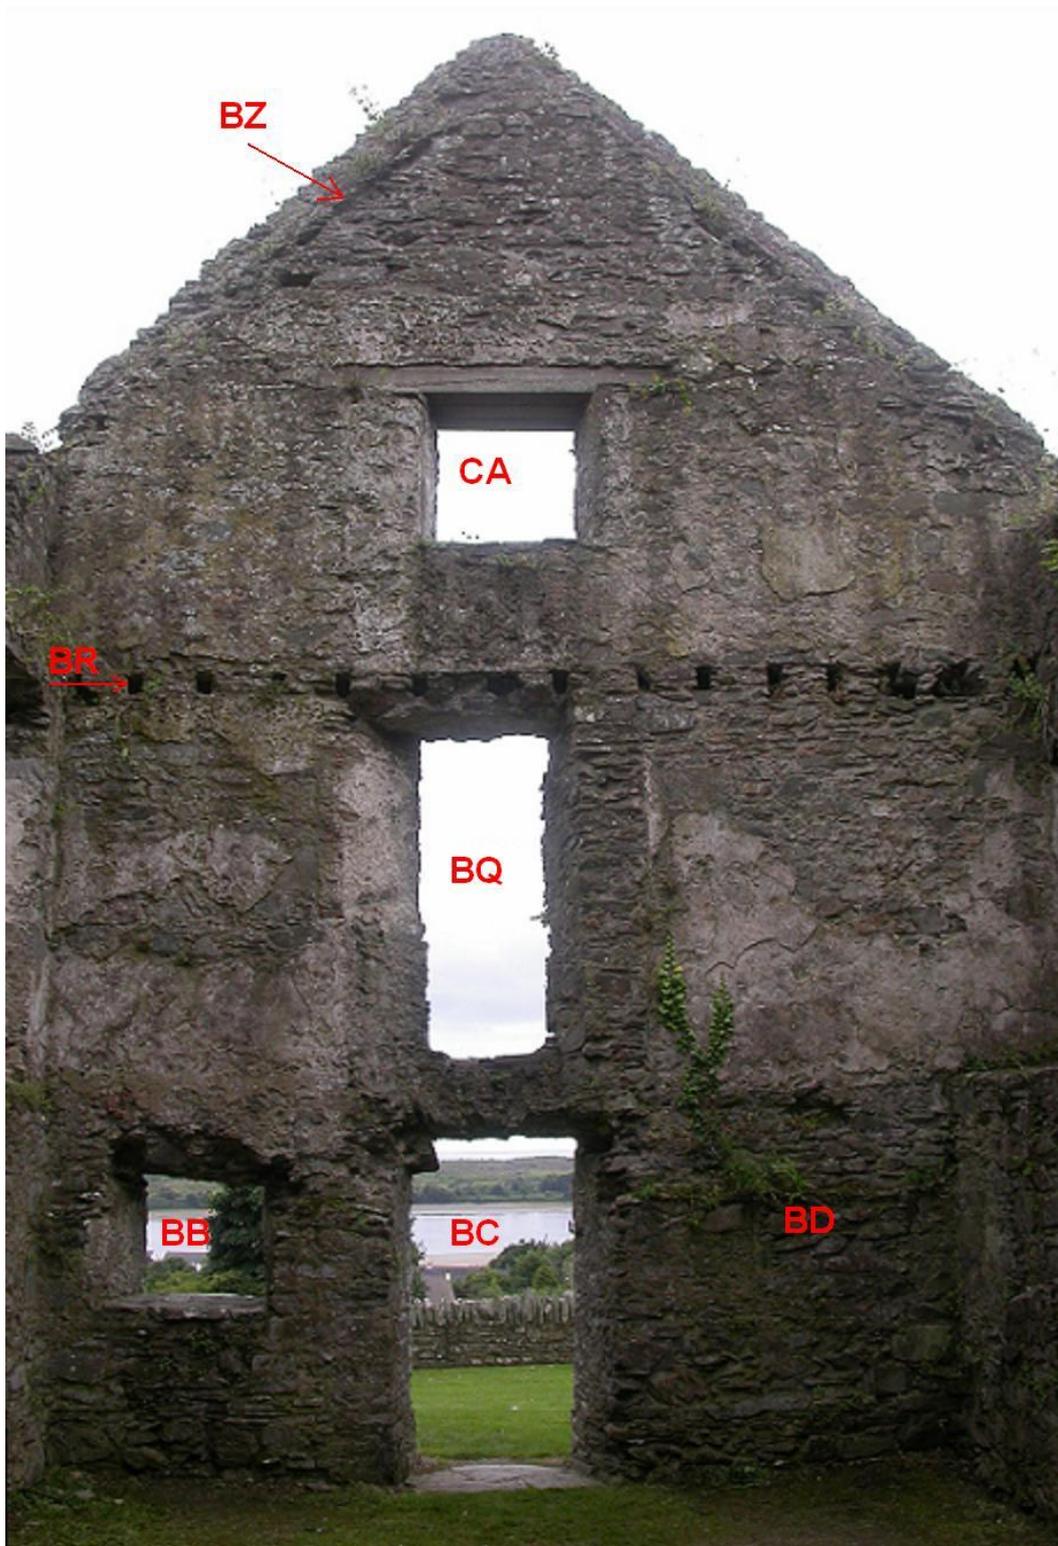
Southern wall of east wing, showing eastern basement window (BB), central basement window apparently extended to form a doorway (BC), blocked western basement window (BD), ground floor opening (BQ), supporting holes for joists (BR), preserved line of roofing 'slates' (BZ) and attic window (CA), looking south.
